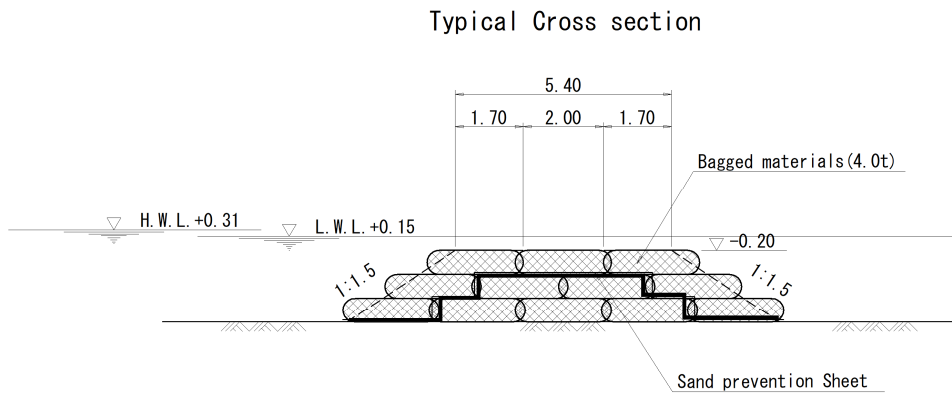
(3) Typical cross section drawing of submerged breakwater (temporary)
